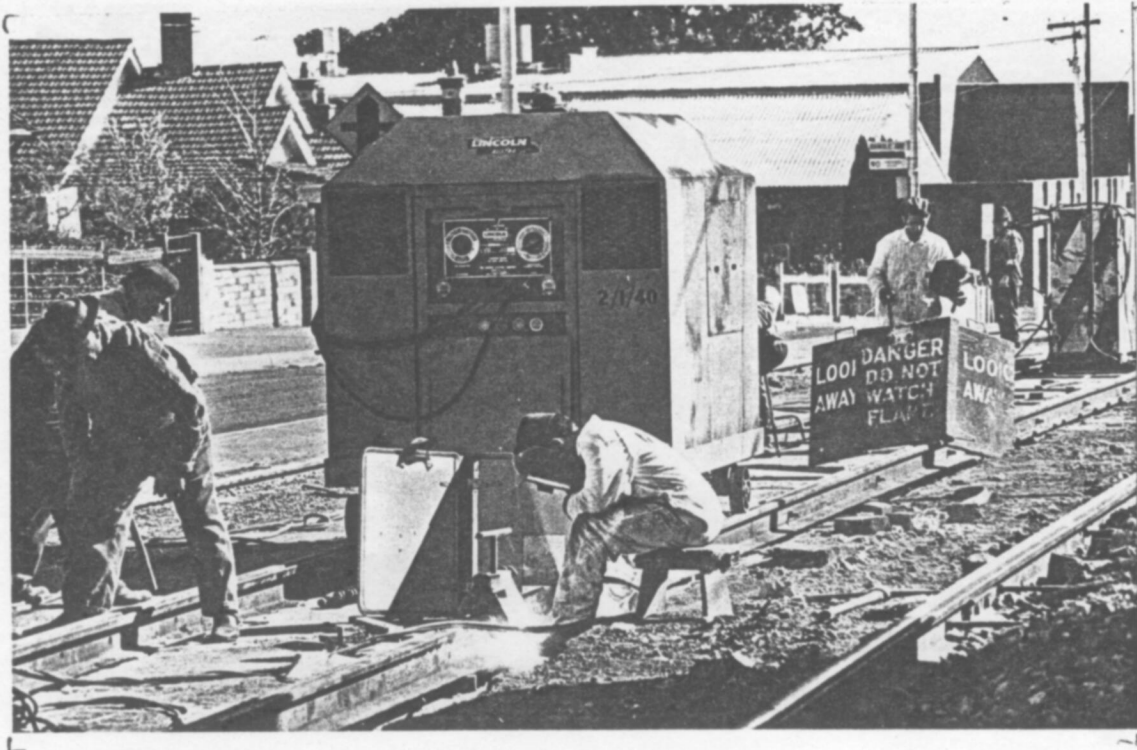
Welding Kirby Joints with Semi-Automatic and Manual Arc Machines.
